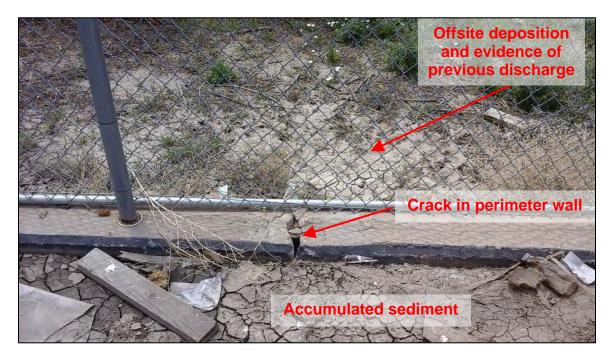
Additional view of accumulated sediment along the south perimeter wall shown in Photograph 26. Note the depth of sediment varied along this perimeter wall.
